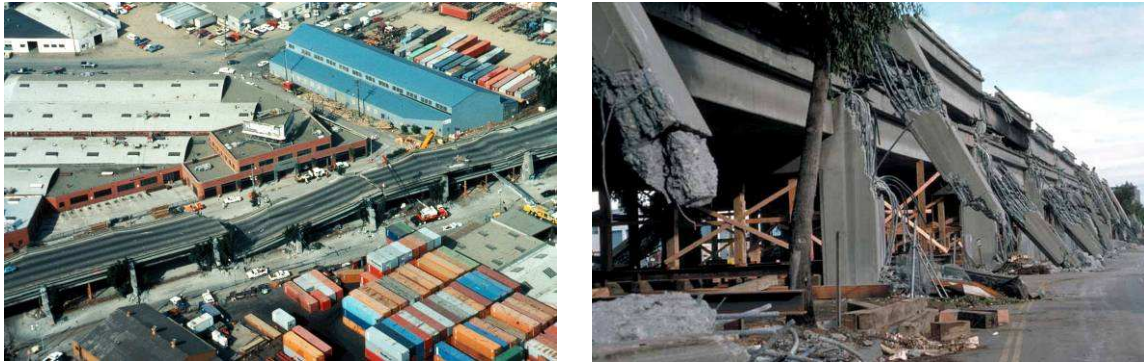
Cypress viaduct collapse: *left* – aerial view; *right* – piers’ failure detailed view.
